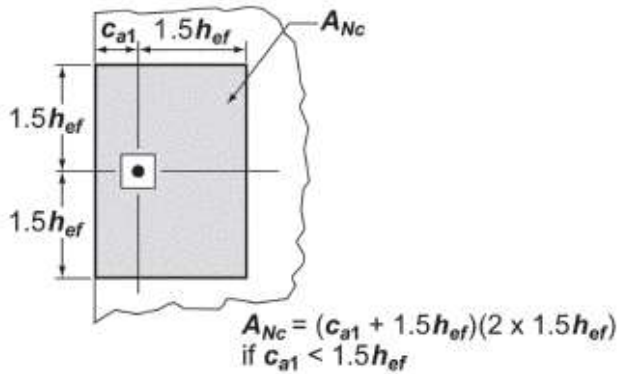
Examples of concrete breakout failure projected area for a single anchor (ACI 318, 2014)
